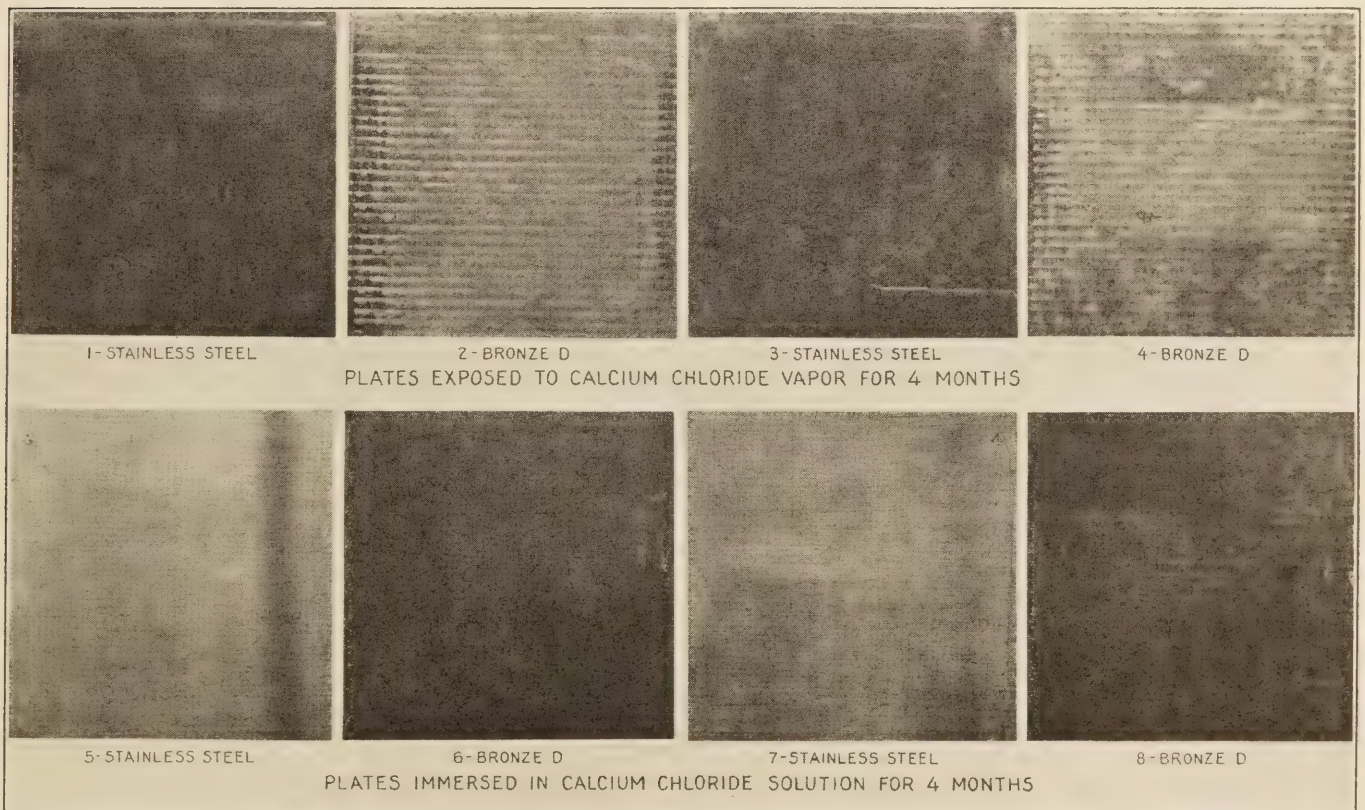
APPEARANCES OF BRONZE AND STAINLESS STEEL BEARING PLATES AFTER IMMERSION IN AND EXPOSURE TO CALCIUM CHLORIDE. STRIPS OF WOOD INSULATED THE IRON CLAMPS FROM THE PLATES. NOS. 1, 2, 5, AND 6 WERE CONTACT FACES, AND NOS. 3, 4, 7, AND 8 WERE OUTER FACES OF PLATES.
